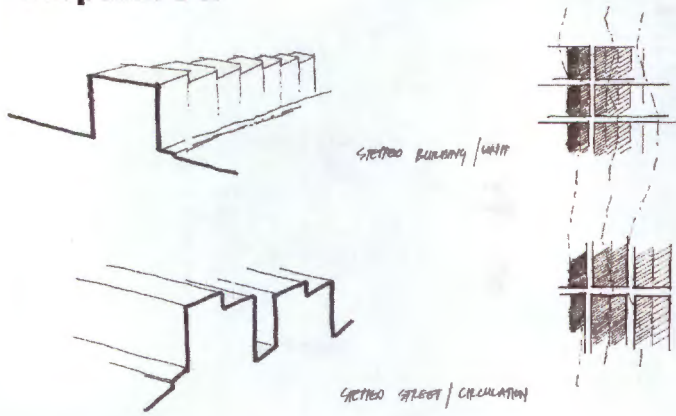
Stepped building vs stepped street (image by author 2010)
